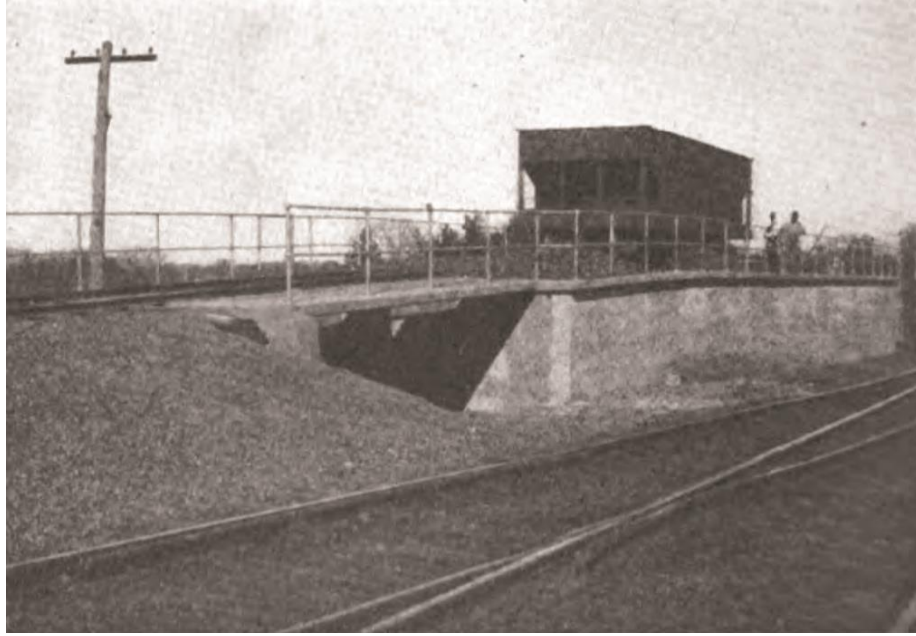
Murray Hill, NJ. Track Approach, 1906. The hopper car is situated on the coal trestle above the pockets. Source: George T. Hand, "Reinforced Concrete Coal Trestle Pocket," *The Railway Age*, November 30, 1906, 684.
